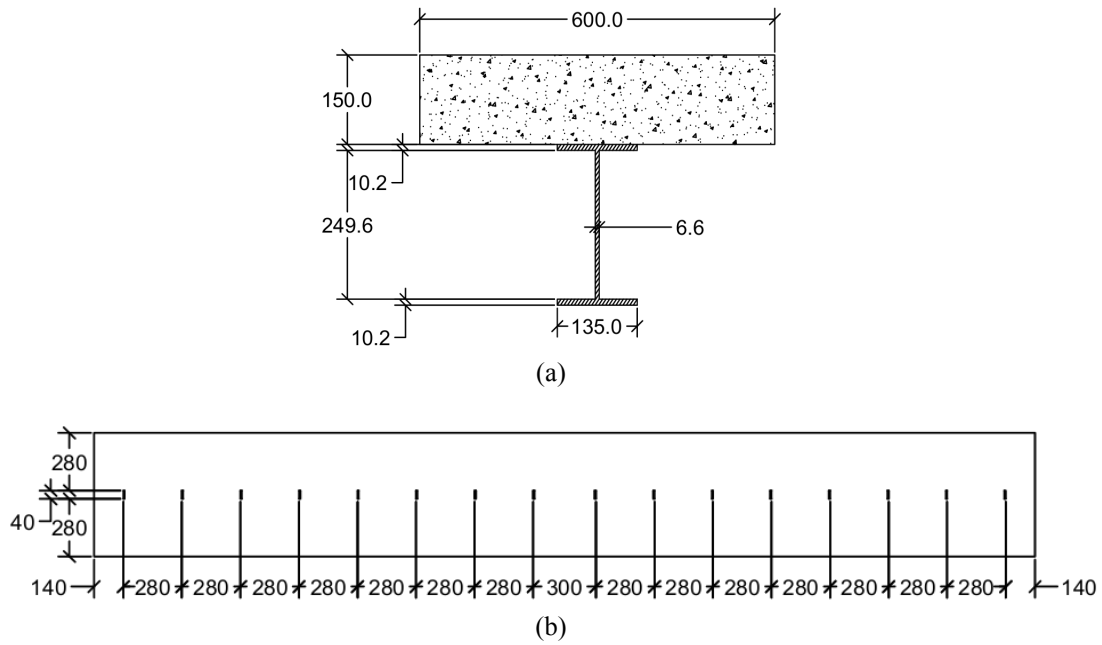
(a) Composite beam cross-section (dimensions in mm); (b) slab plan and channel shear connectors with 40 mm length
